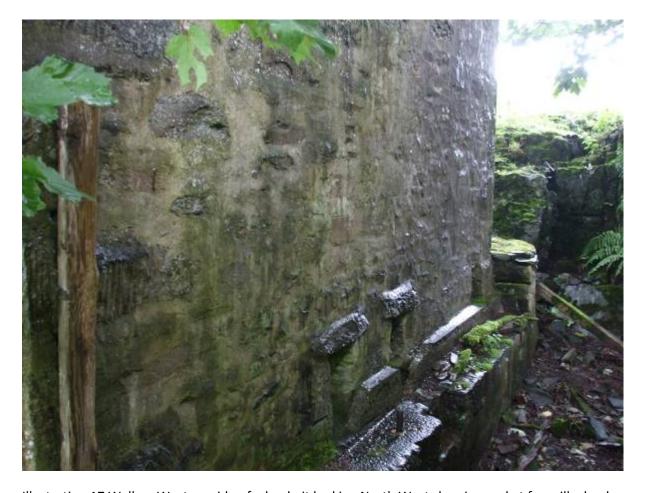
Wall on Western side of wheel pit looking North West showing socket for mill wheel
